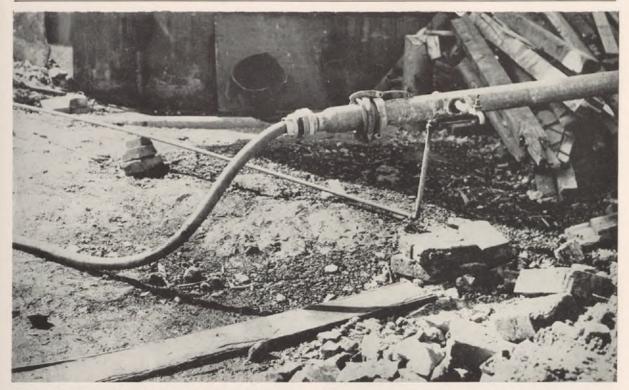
Emergency pipe line laid on air raid rubble, with hose connection and branch pipe. Note faucet welded directly into pipe.
